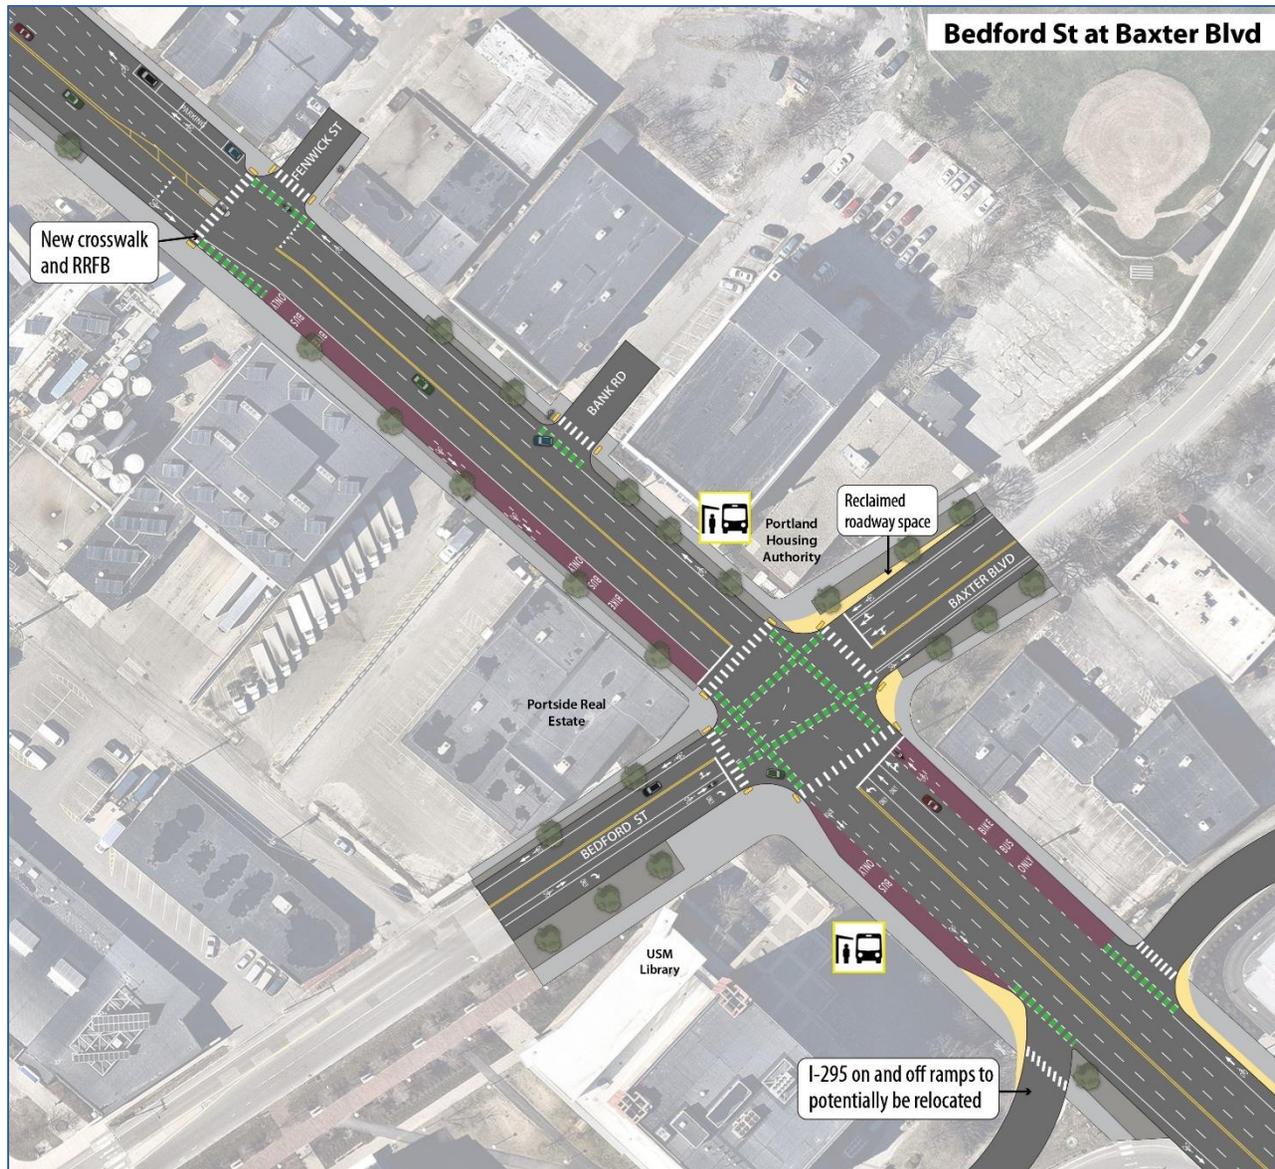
Alternative 1 – Forest Avenue at Bedford Street/Baxter Boulevard
